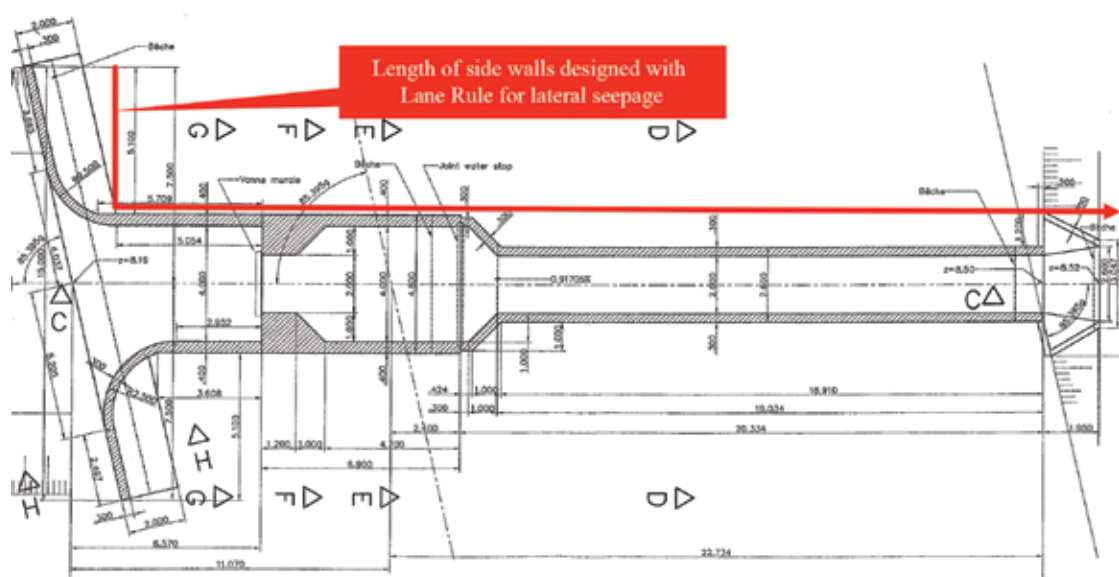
Plan of hydraulic crossing structure at Aramon (courtesy Thibaut Mallet)
